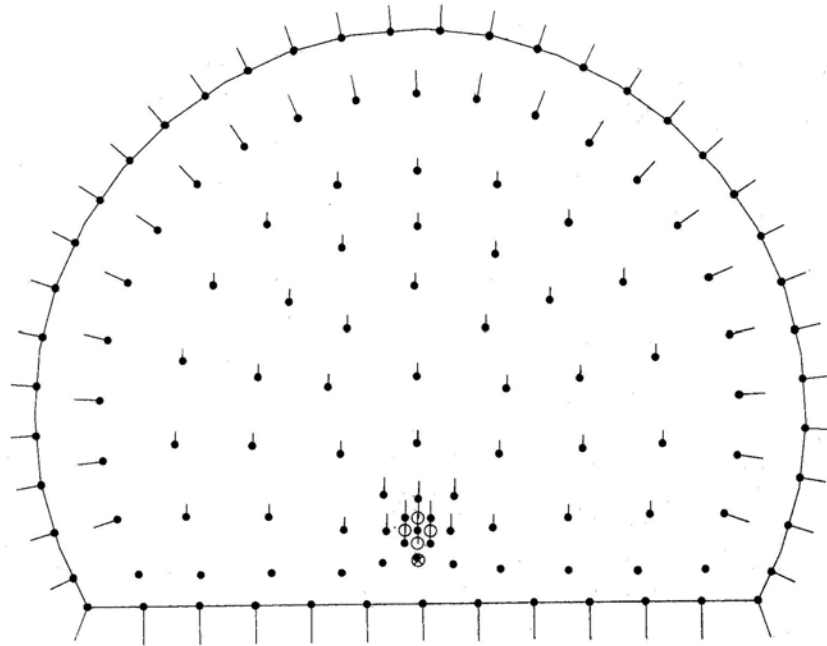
Drilling pattern for 45 mm and 64 mm drill hole diameter.
